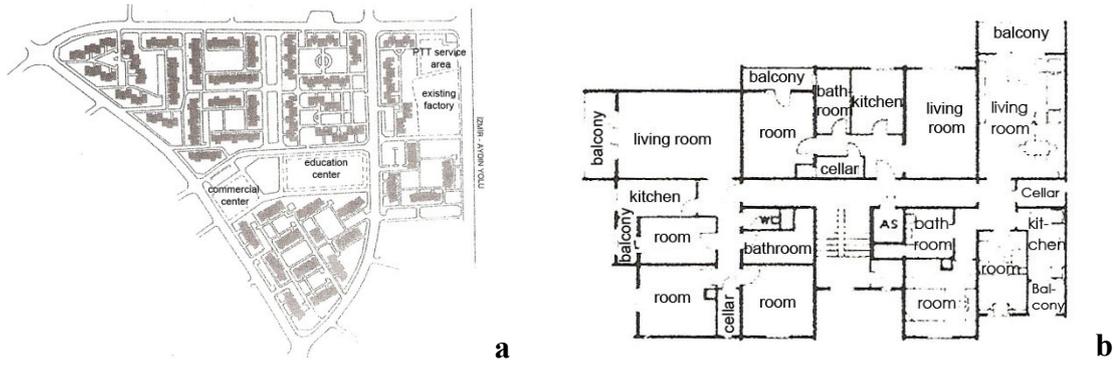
Gaziemir Mass-Housing, Izmir, 1989-1995: a. Site plan; b. The typical plan of a floor (Source: Koç 2001, 365, 368)
